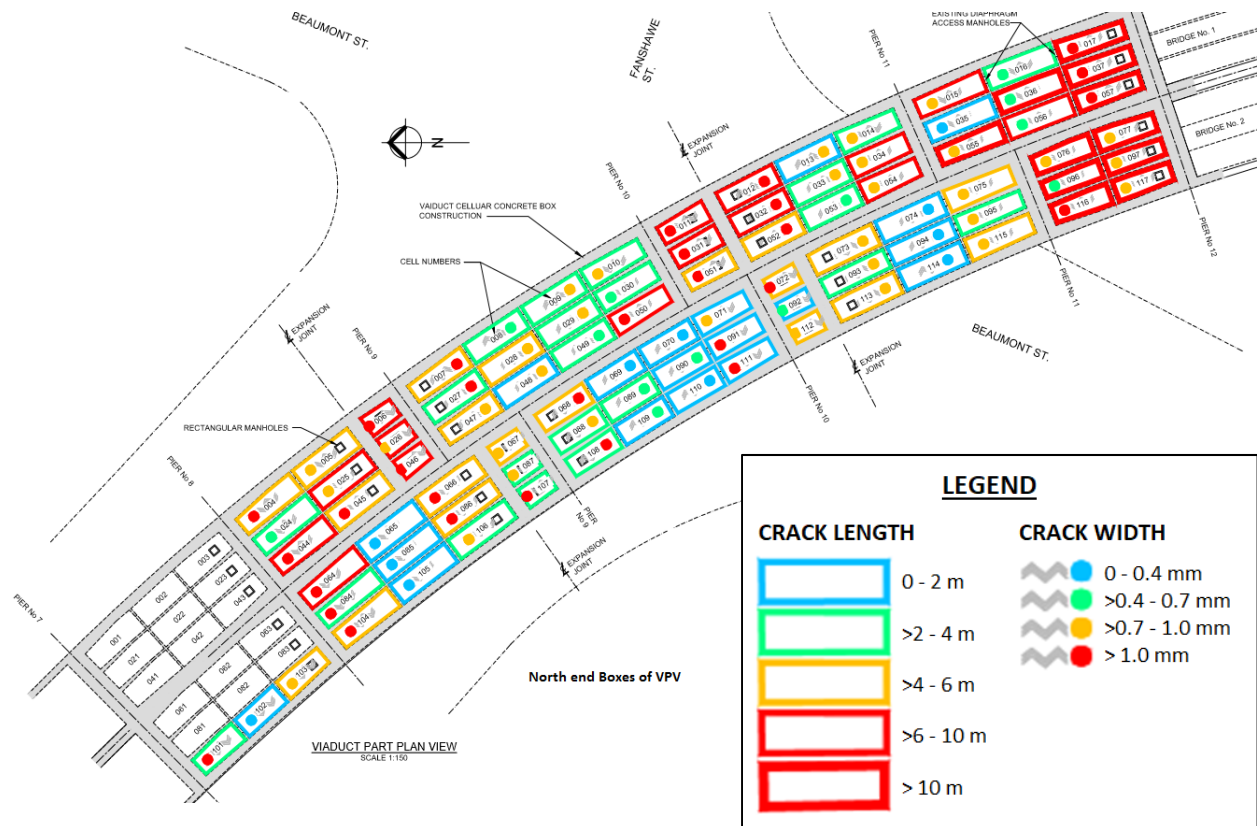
VPV Box Condition Diagram from 2015 Inspections – Crack Length and Width
